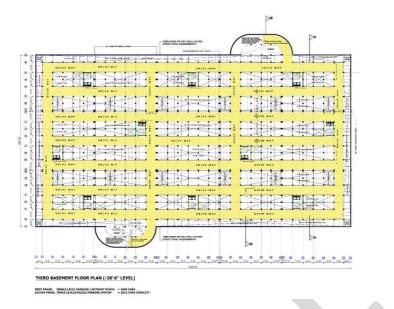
Third underground floor plan © Department of Urban Planning, U.T. Chandigarh
